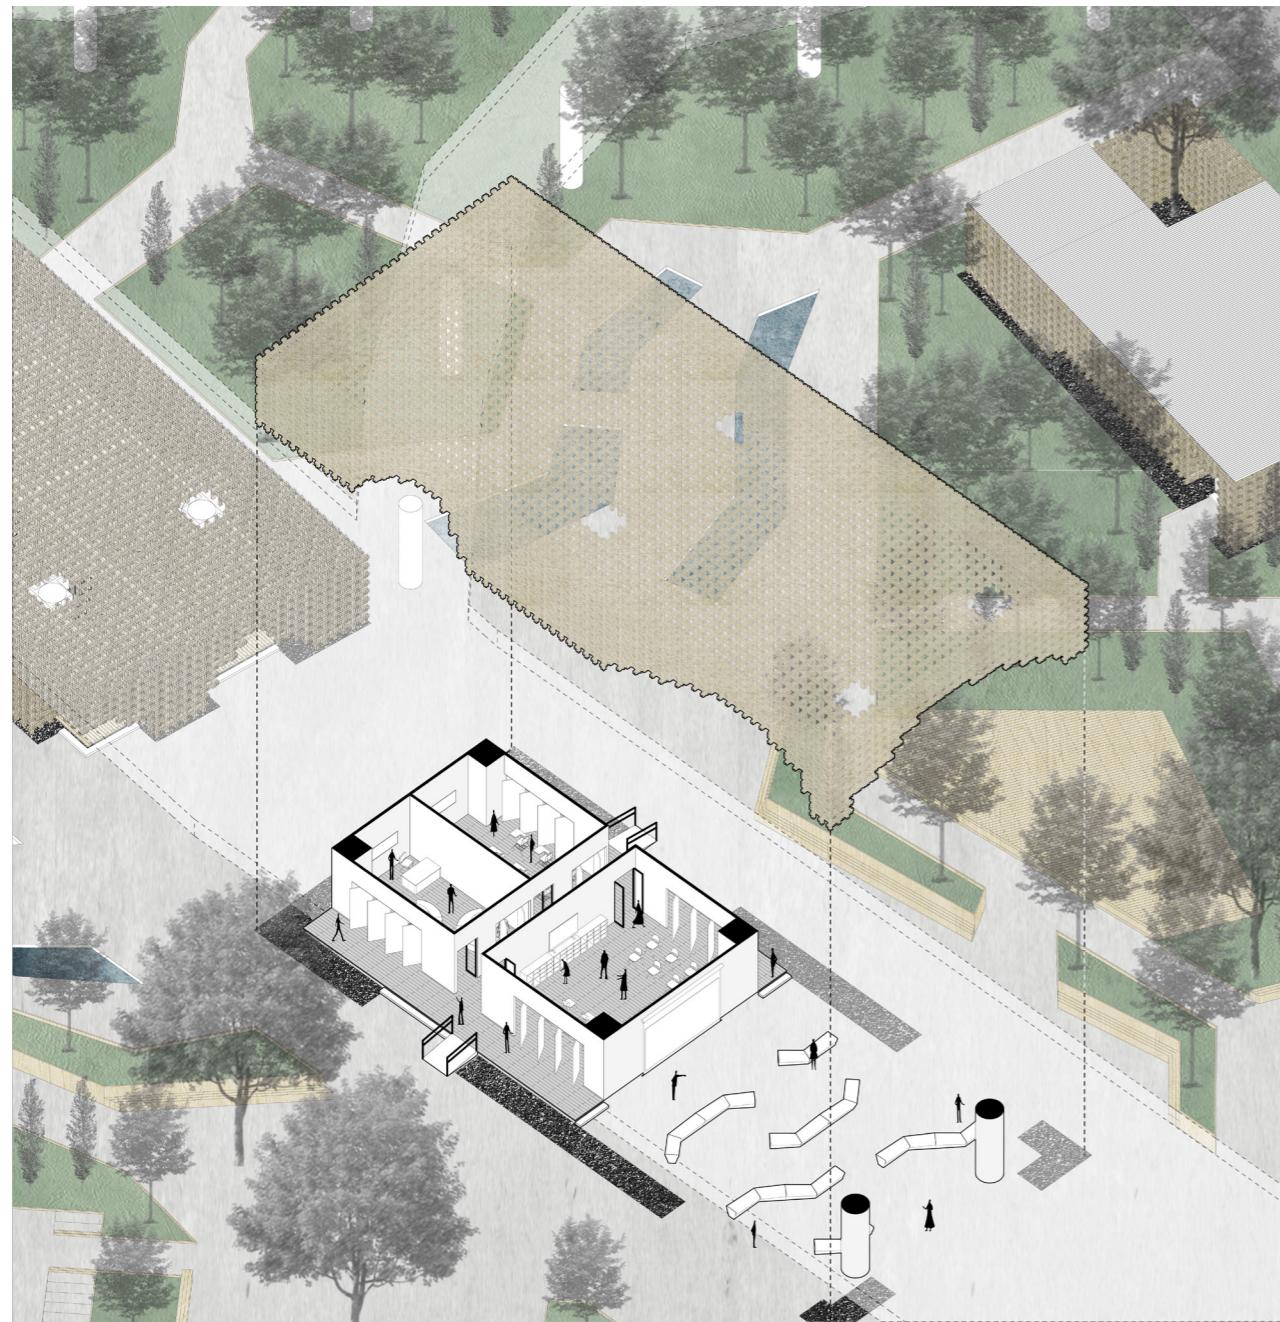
Exploded axonometric drawings of Main Pavilion 2
